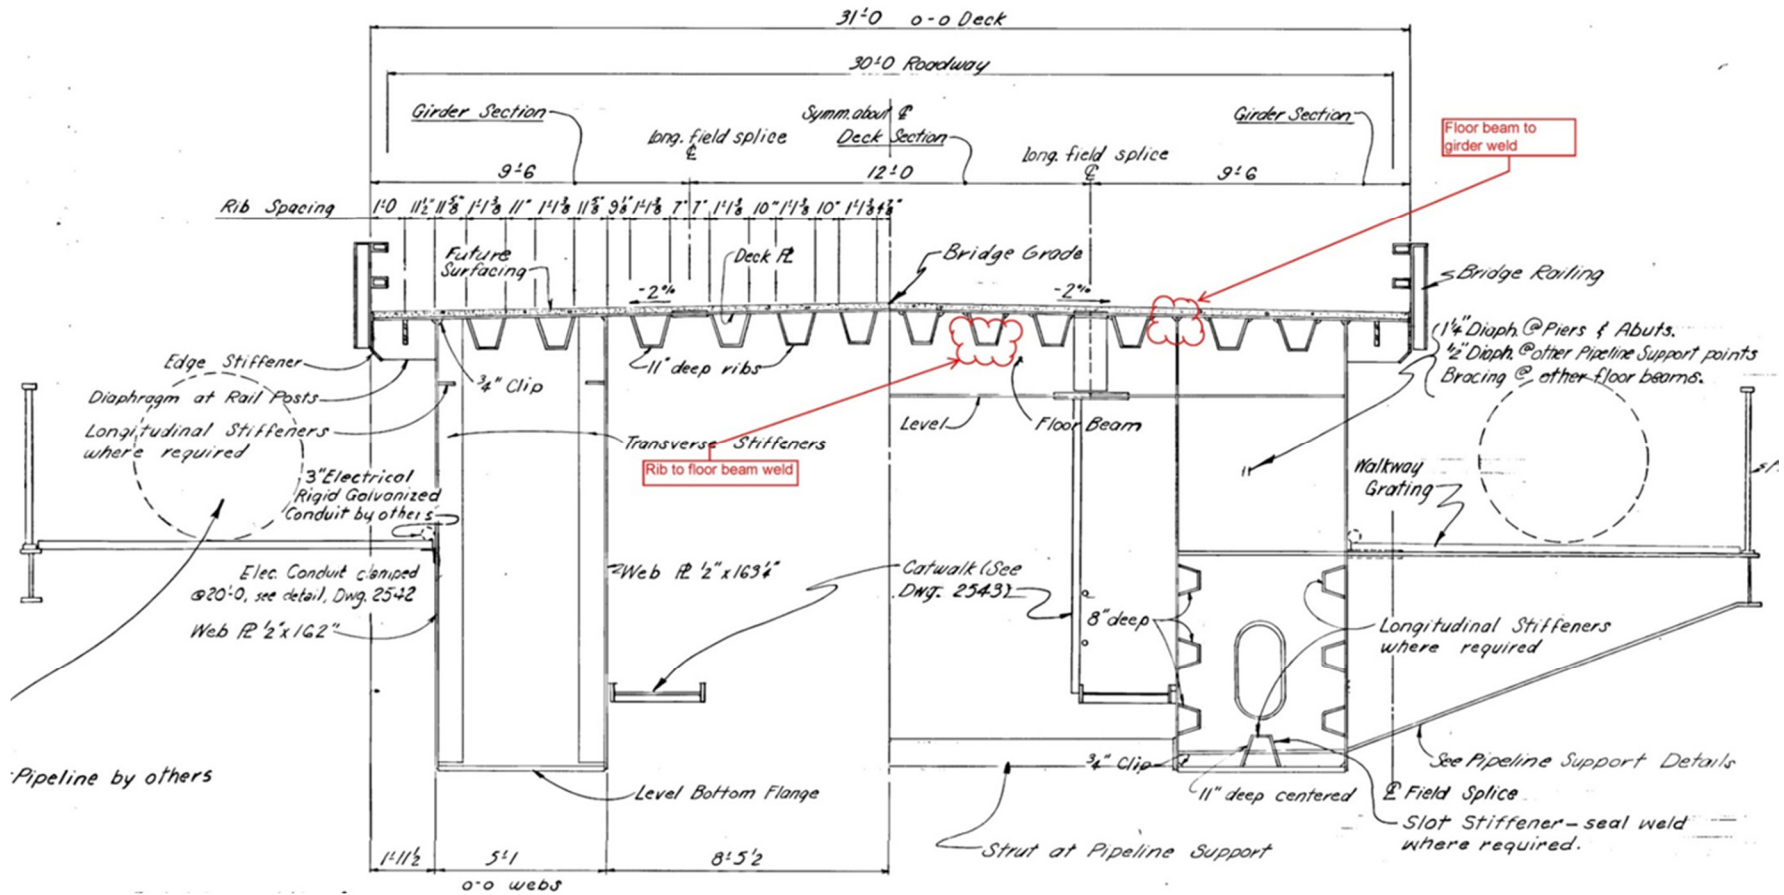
Yukon River Bridge Superstructure Typical Cross Section
